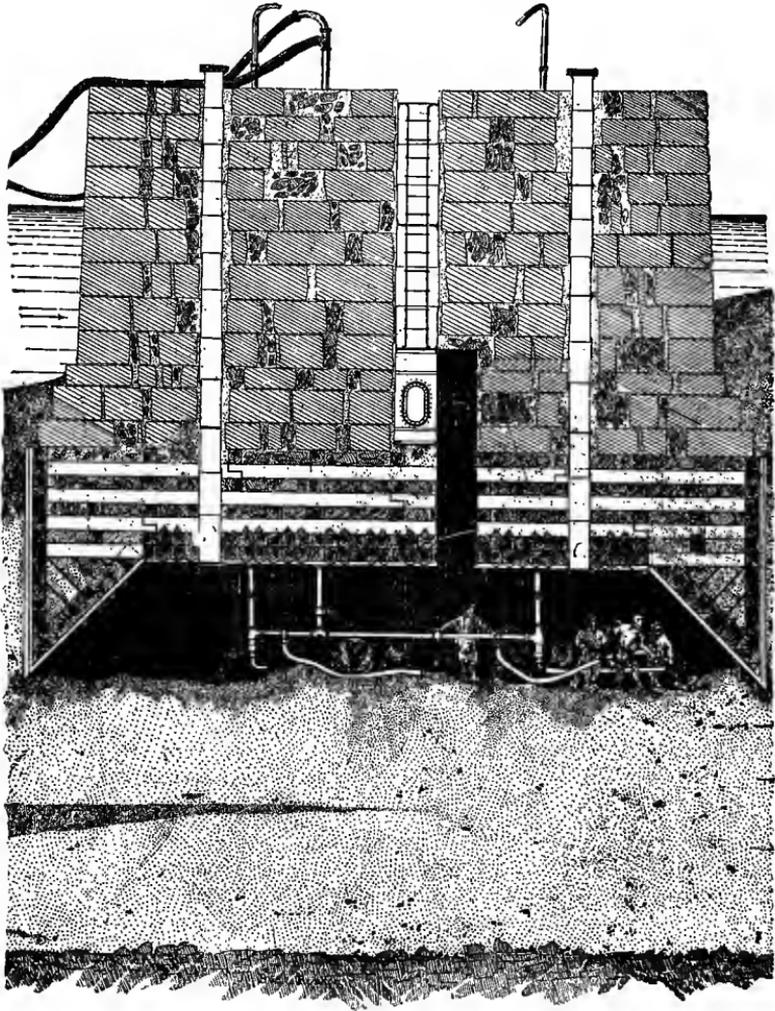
PNEUMATIC CAISSON. CHANNEL PIER BLAIR BRIDGE.\
